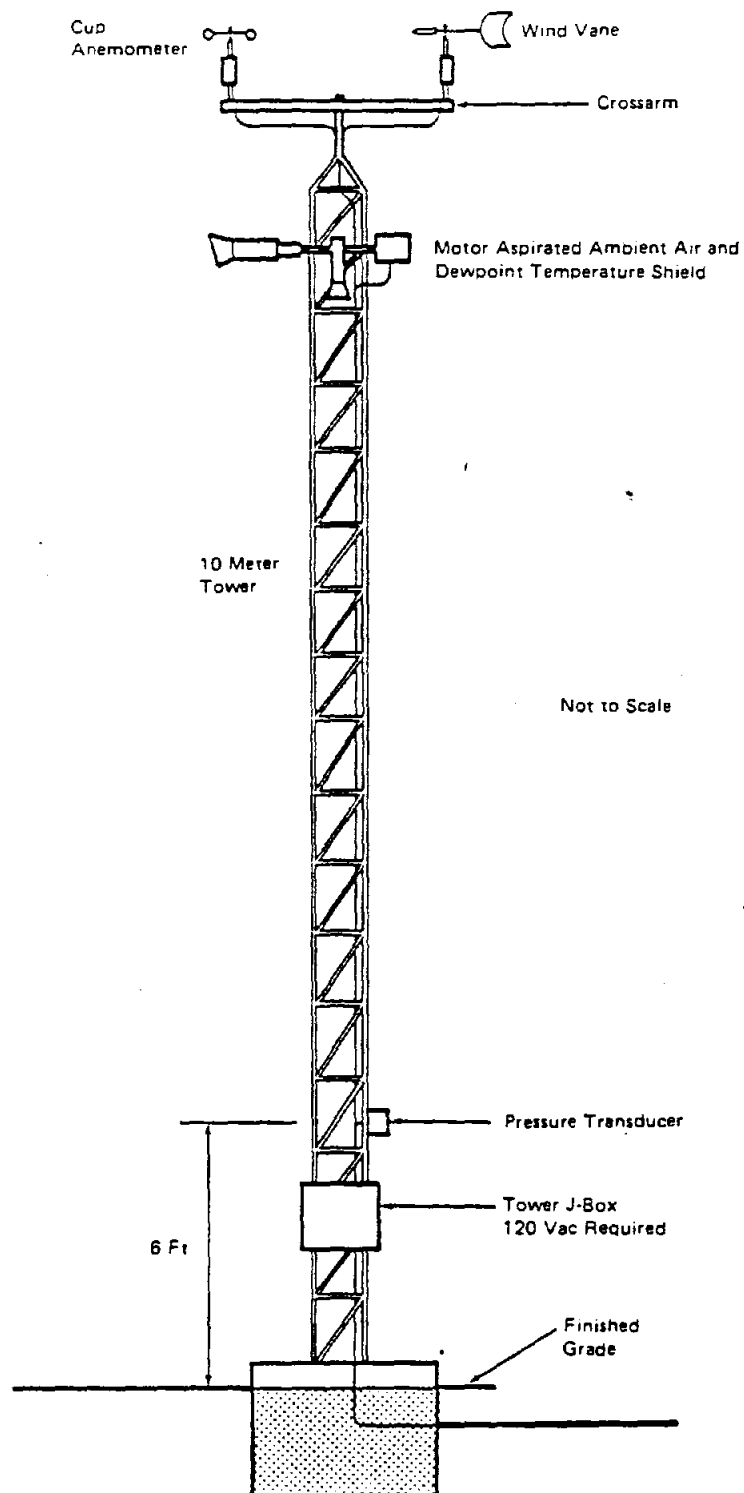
Mounting Location of Meteorological Sensors on 10-Meter Tower
